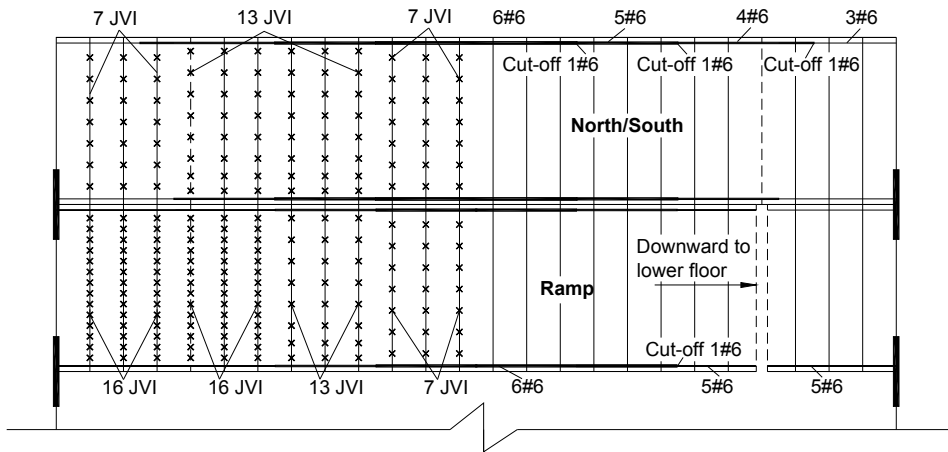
Diaphragm reinforcement at other floors for example 1A.
